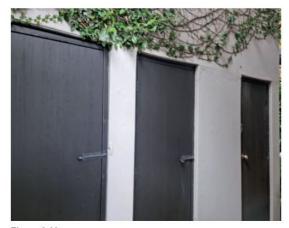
Storage area on the south-west corner of the subject site, that appears to have been constructed later on.
